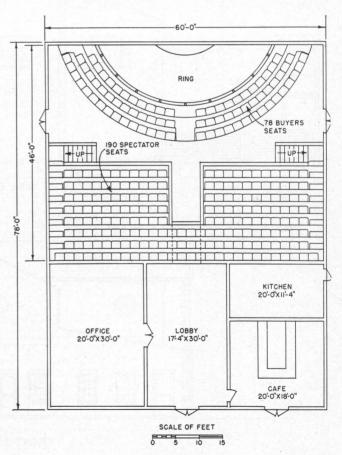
Floor plan of the suggested sales barn showing an alternate seating arrangement. The auctioneer's box and entrance and exit gates to the sales ring would be the same as those shown in Figure 35.
